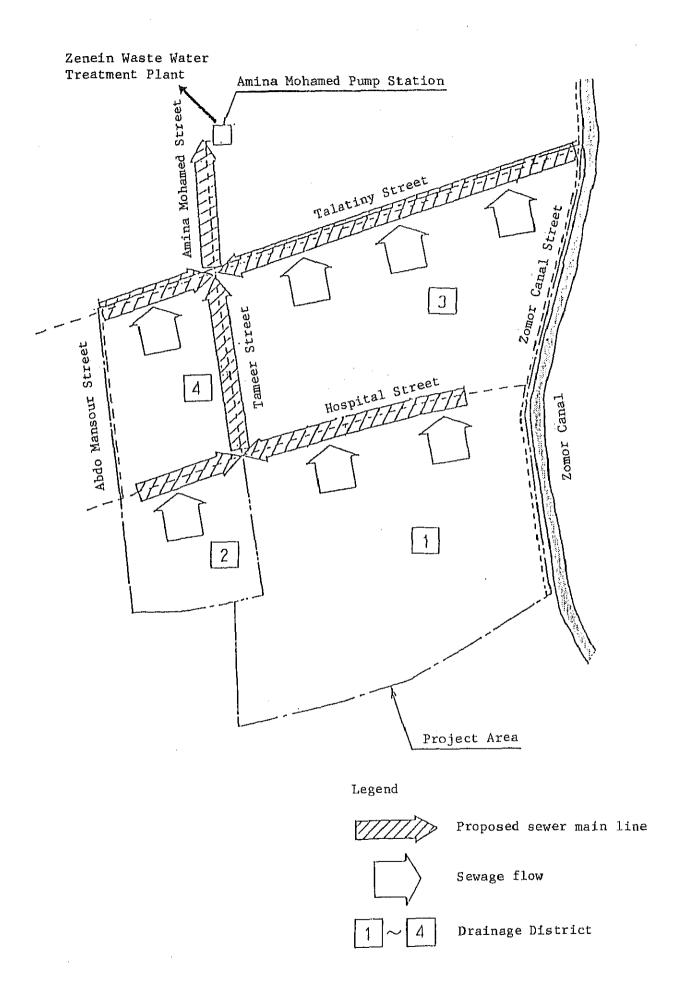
Drainage System Chart of Proposed Sewer Facilities
